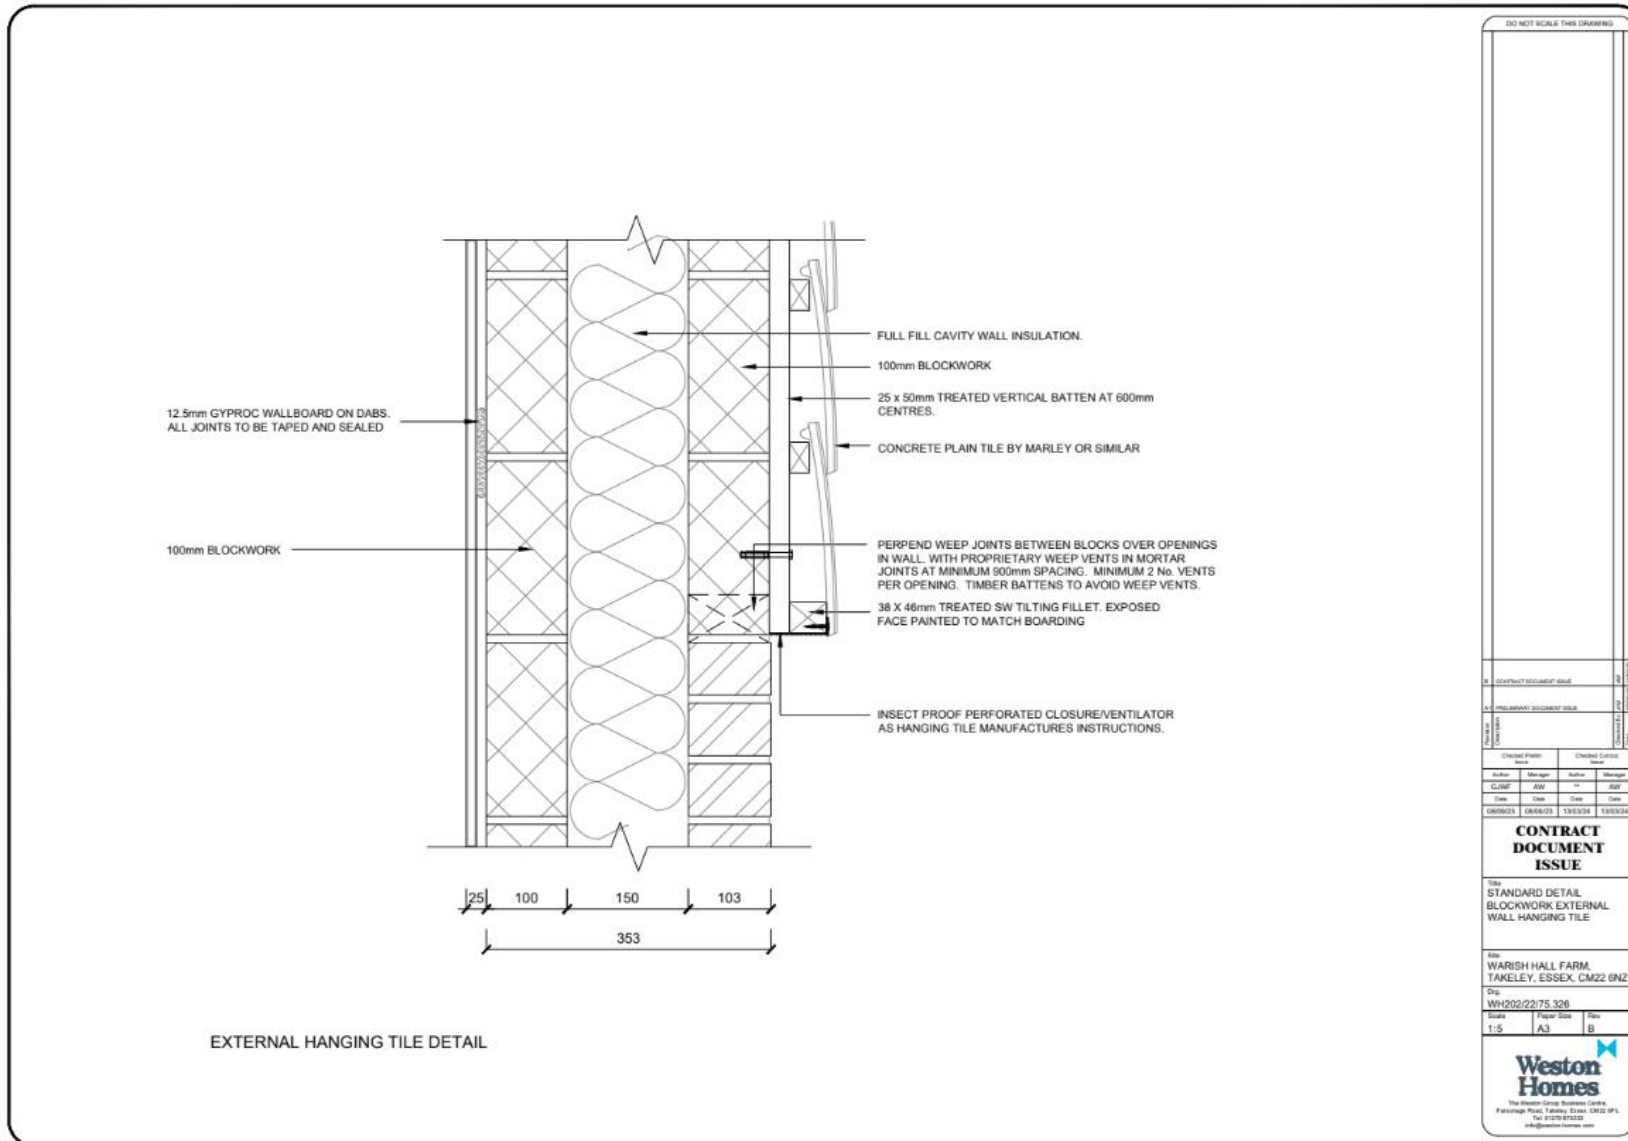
External Wall Construction Drawing WH202/22/75.326 – Jacks Lane
